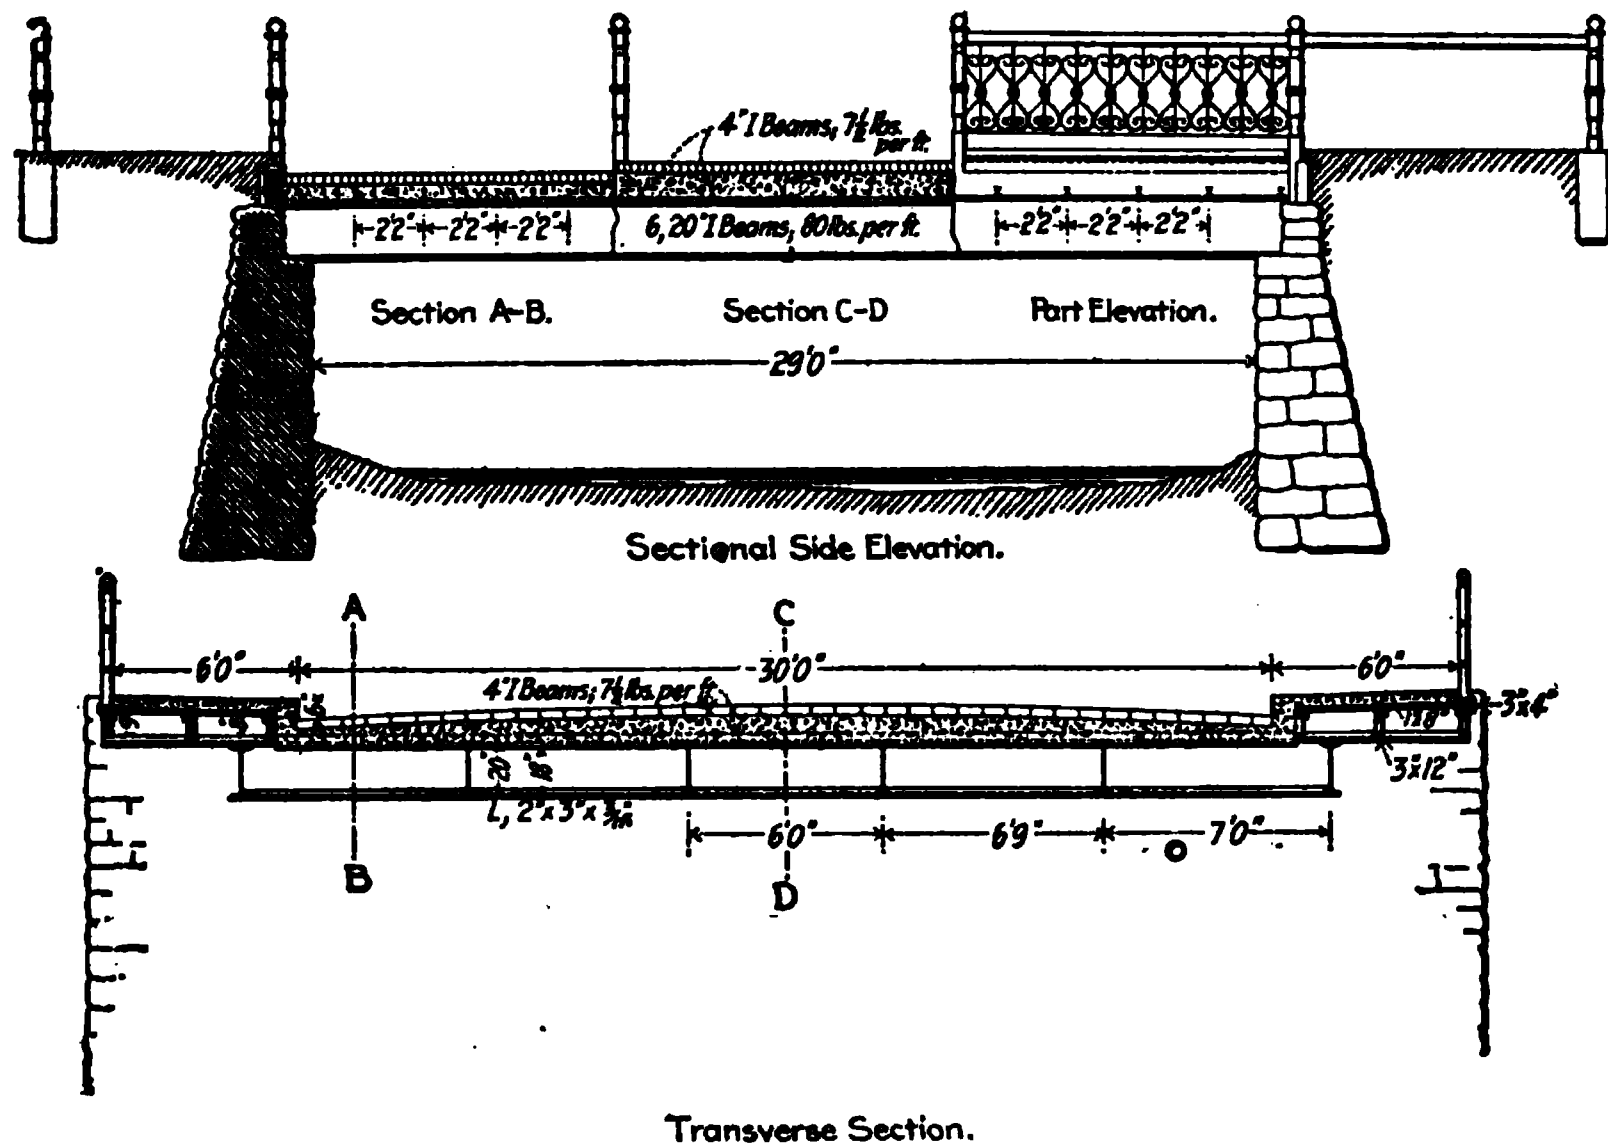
BEAM BRIDGE WITH SOLID FLOOR.
